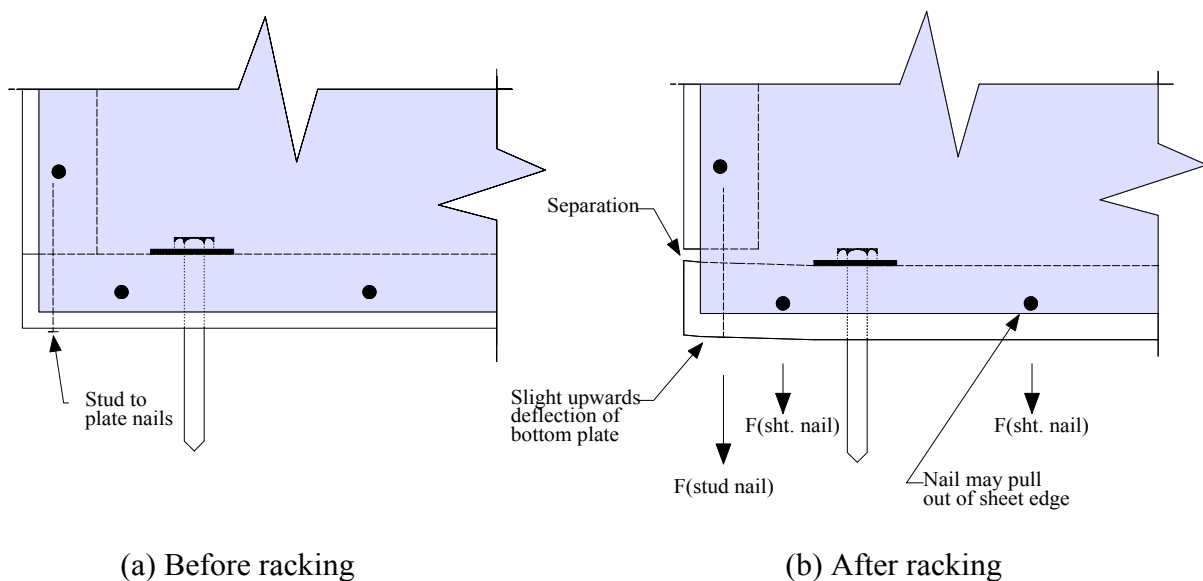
‘Rocking’ action for wall on concrete foundations.
